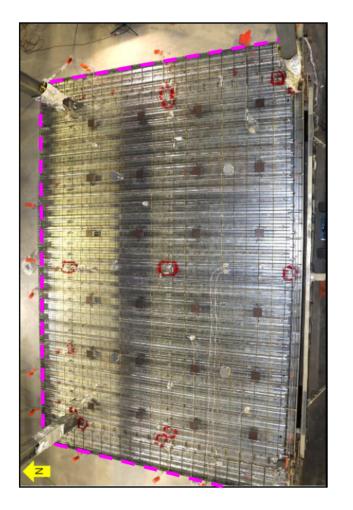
Construction photo showing the rebuilt test floor prior to the concrete pour for CF2. The fire-tested floor for CF1 was demolished back to the slab splice, without affecting the surrounding floor.
